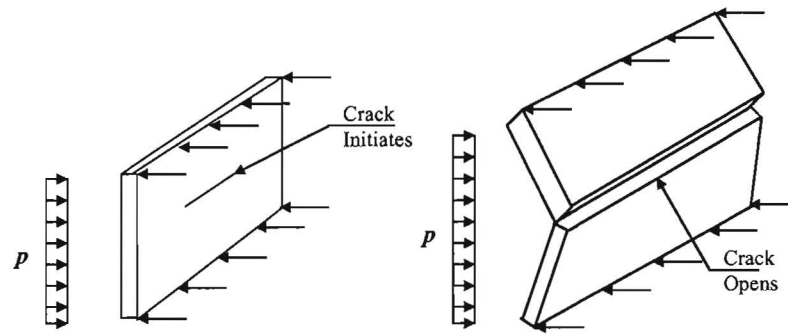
Unreinforced masonry wall spanning vertically and subjected to lateral load
